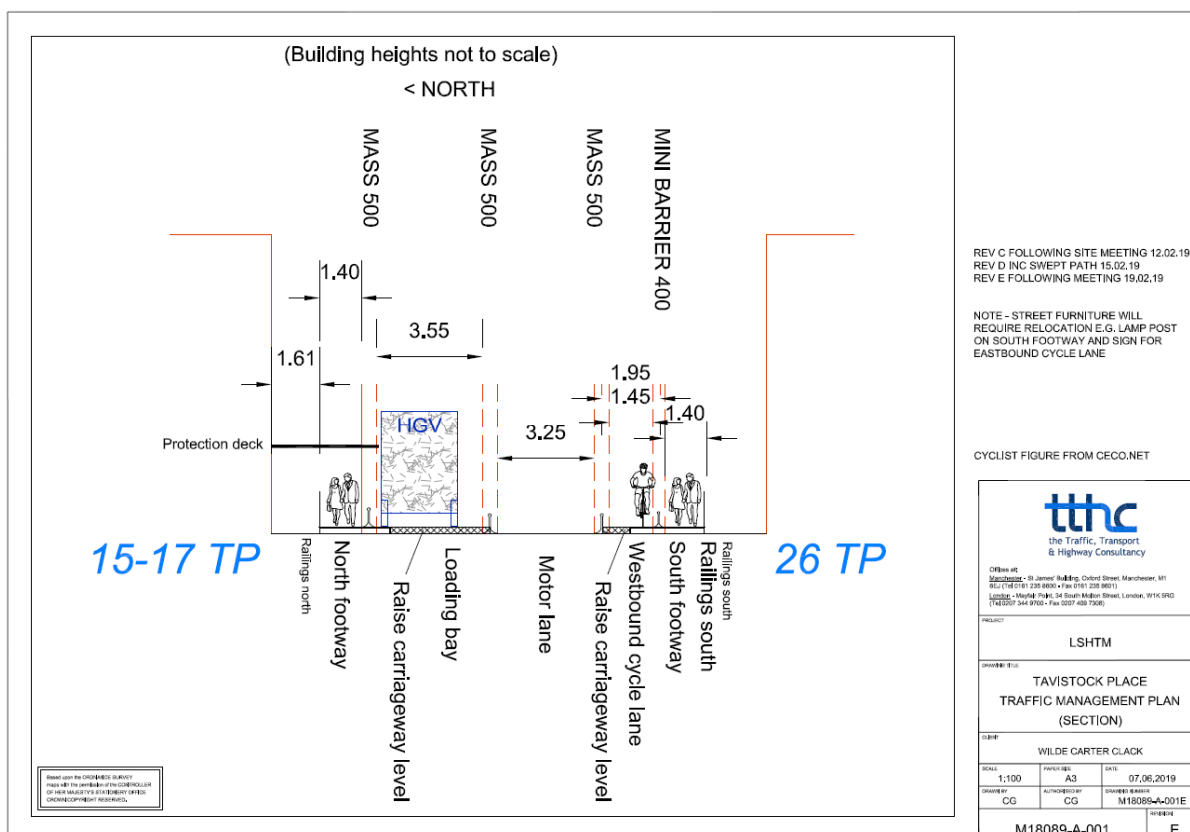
Cross section through Tavistock Place showing highway users and delivery pit lane.
